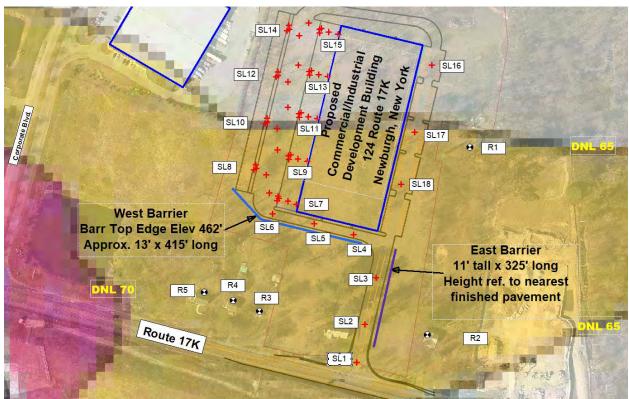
Recommended West and East sound barrier wall Proposed Commercial/Industrial Development, Newburgh, NY
